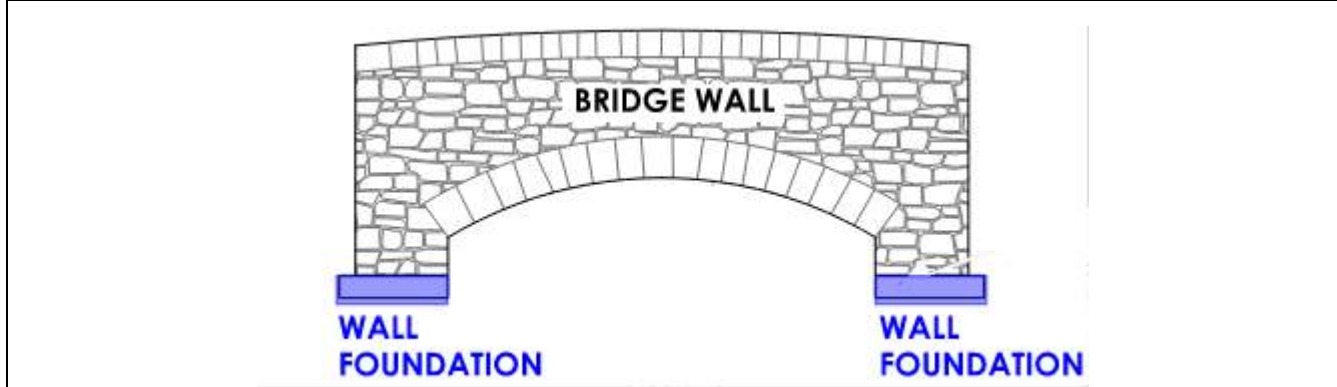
Elevation: Bridge Deck, Wall, Padstone and Foundation References
